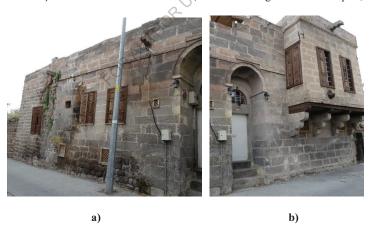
a) Başak Güntan House West Facade View, b) Başak Güntan House West Facade View
